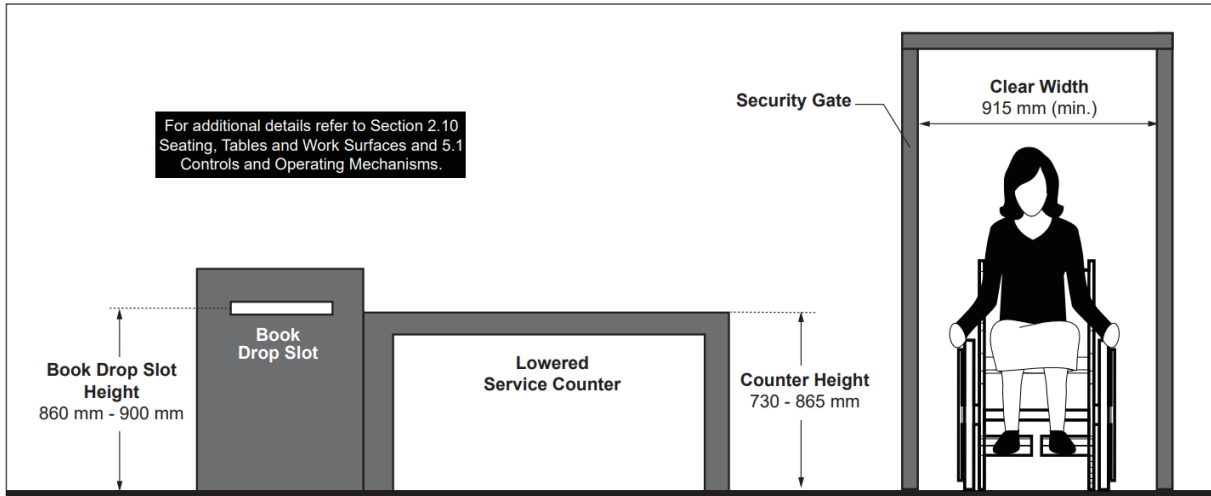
Security Gate, Service Counter and Book Drop - Elevation View
